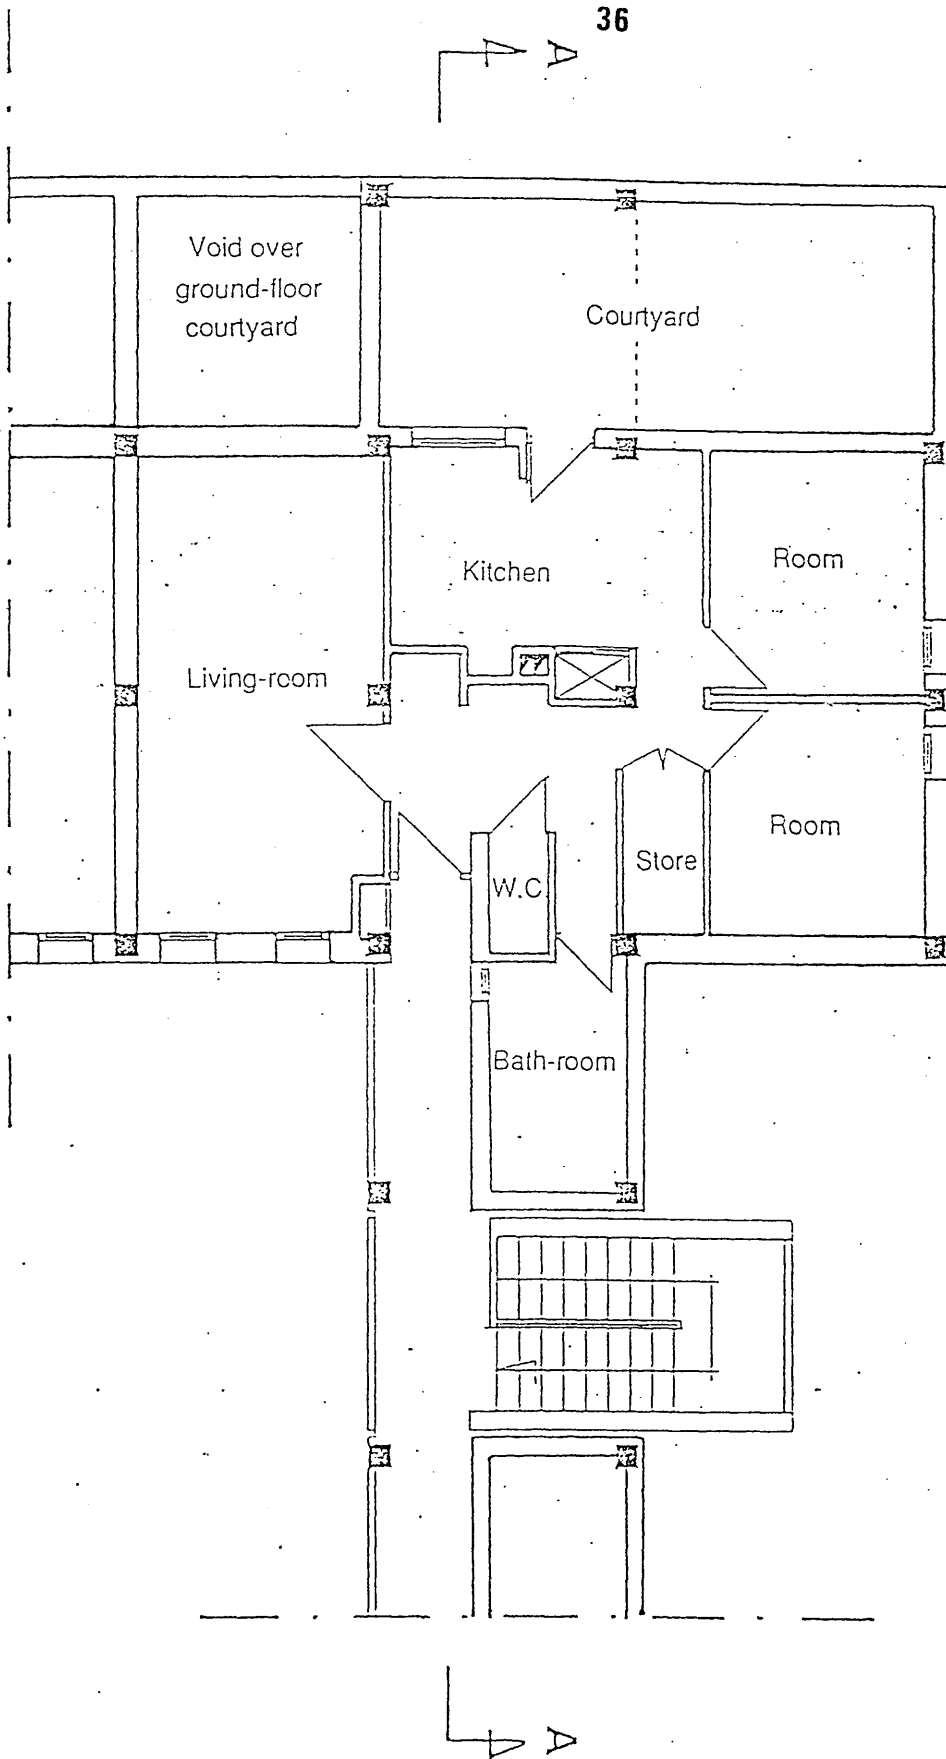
a: Plan of modern house, first floor type. Analysed model.
